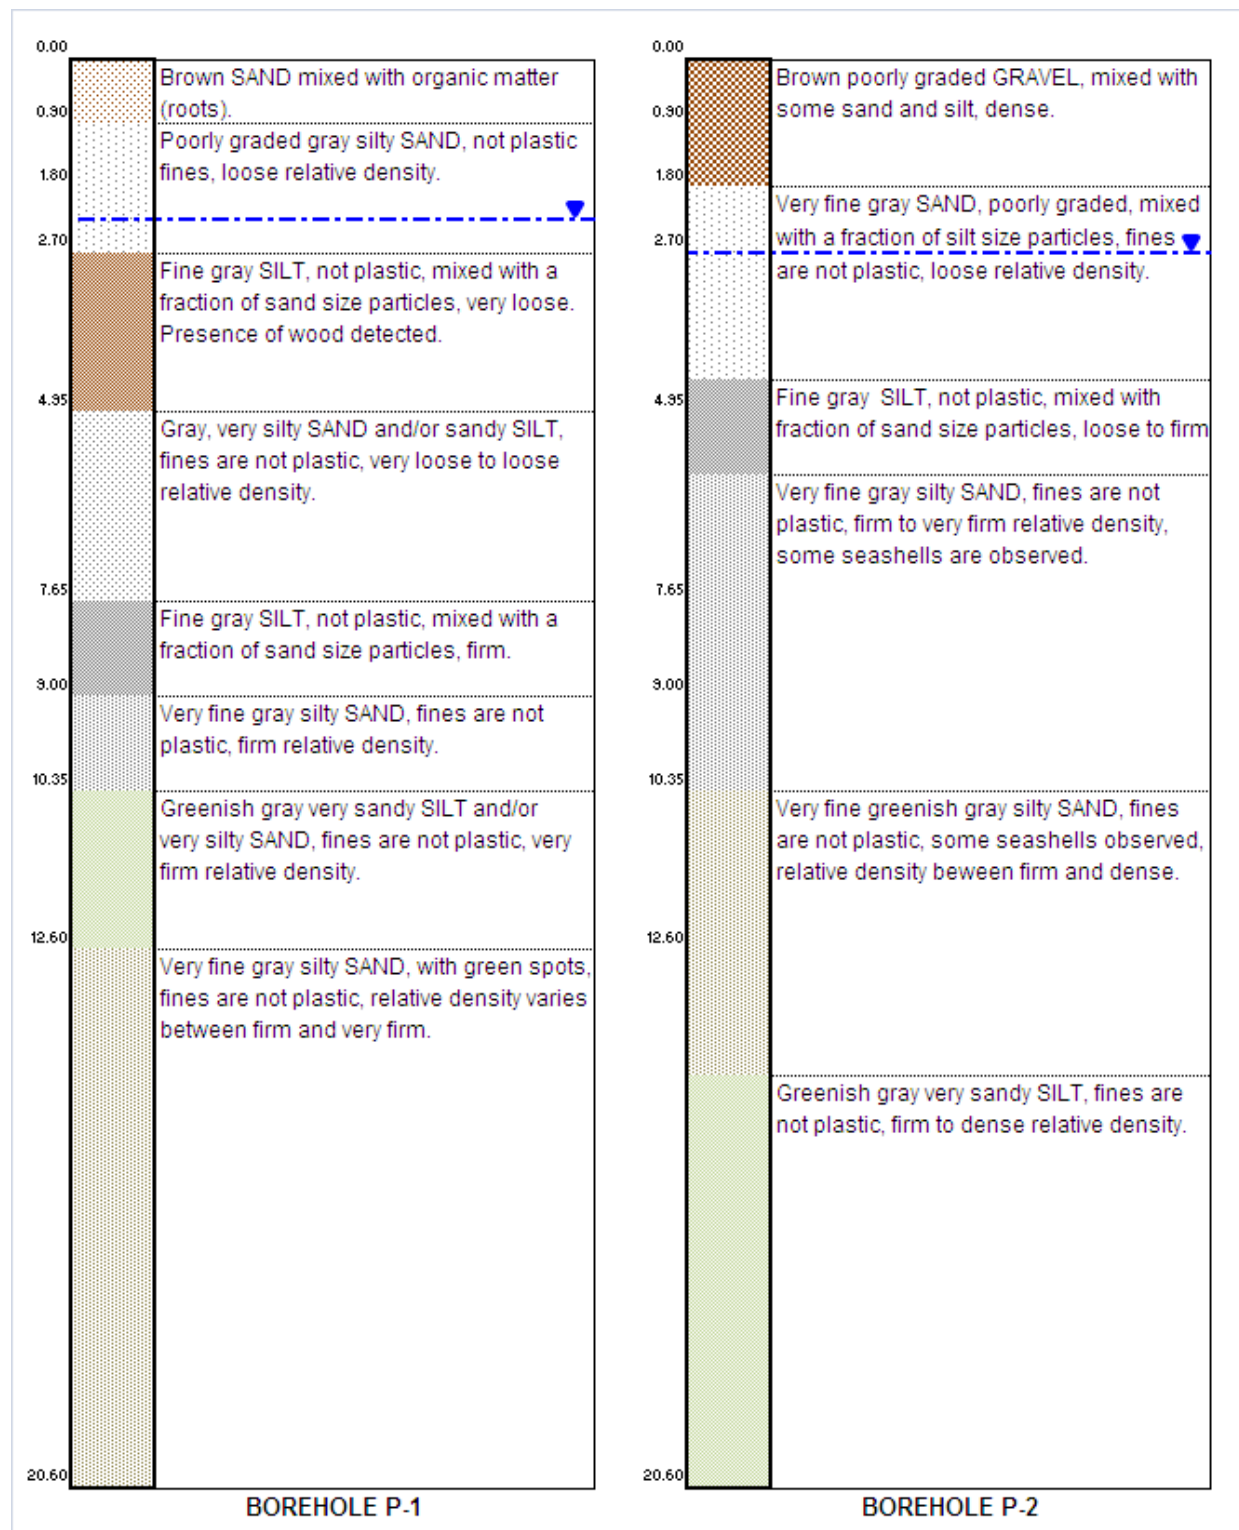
Soil profile detected at the Río Bananito Highway Bridge site
